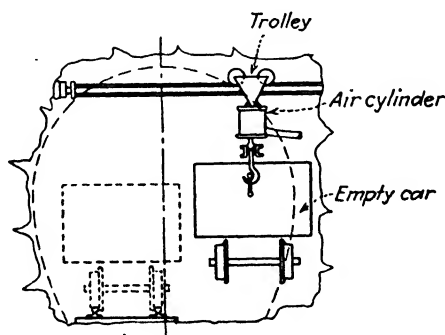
O'Rourke beam-and-hoist cherry picker for small tunnels.
